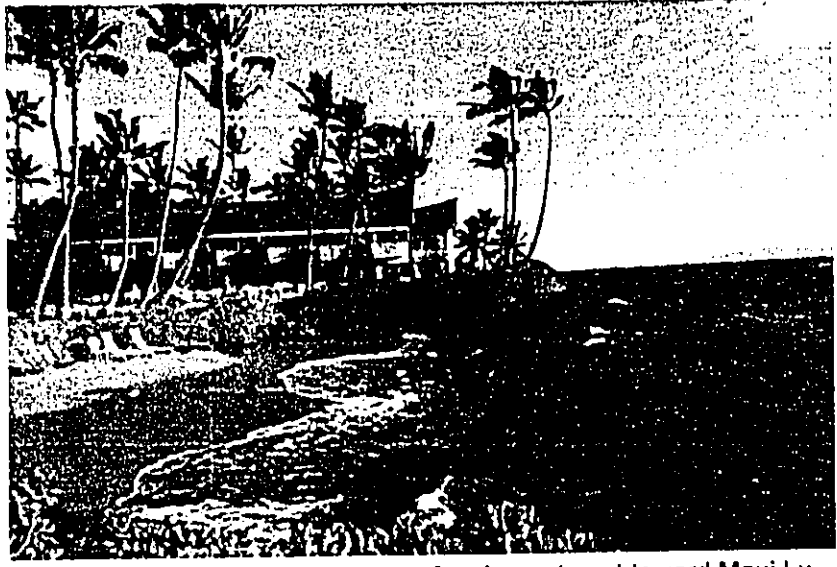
Looking south from top of rock revetment toward Maui Lu Hotel, Buildings B & C.
